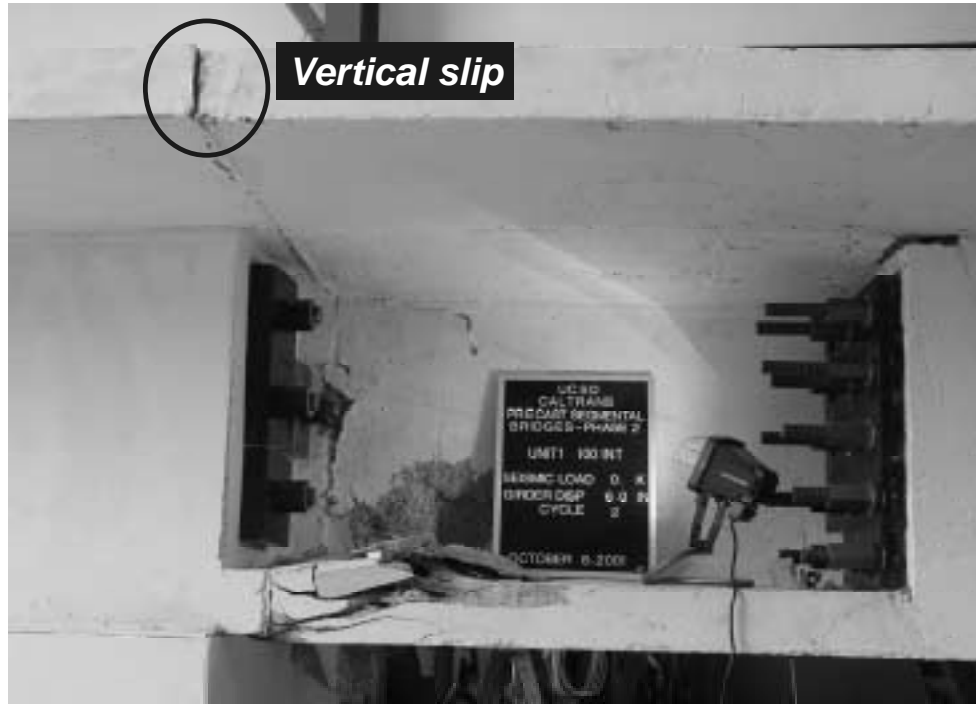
Compression failure of Test Unit 100-INT under downward loading
